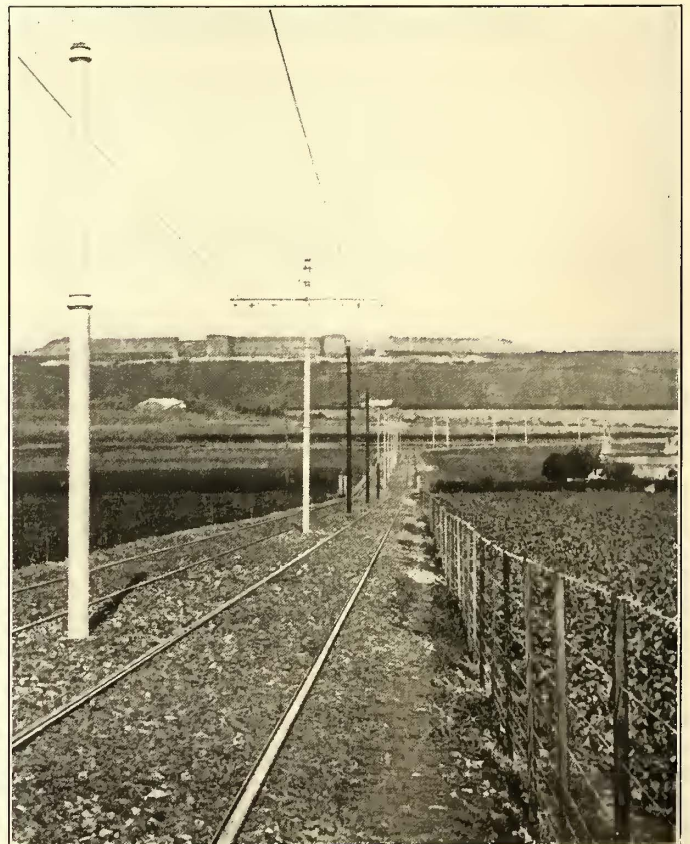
SECTION OF TRACK OVER RIGHT OF WAY
